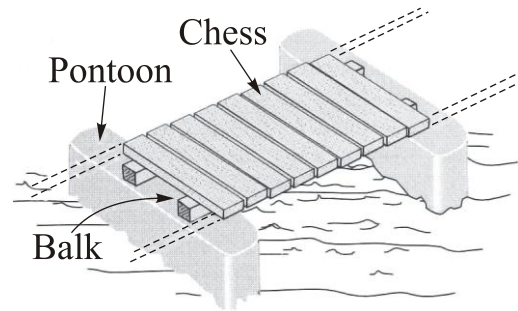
A pontoon bridge consisting of two longitudinal wood beams (balks) that span between adjacent pontoons and support the transverse floor beams (cheeses)
